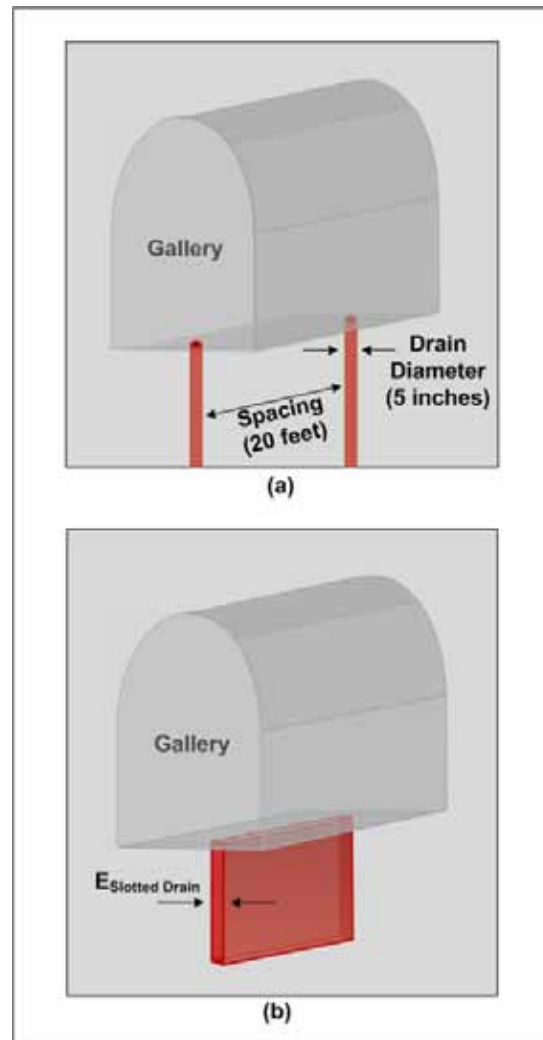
Rock drain configuration (a) actual rock foundation drain (b) ideal 2-dimensional slotted drain per foot run of dam.
